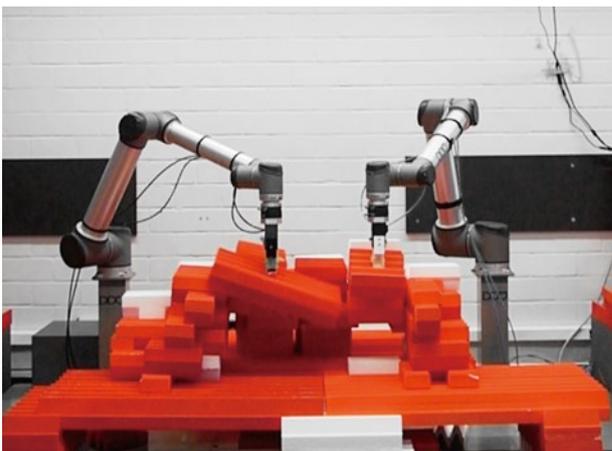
The robotic assembly of a part failed due to tolerances in the grasping
